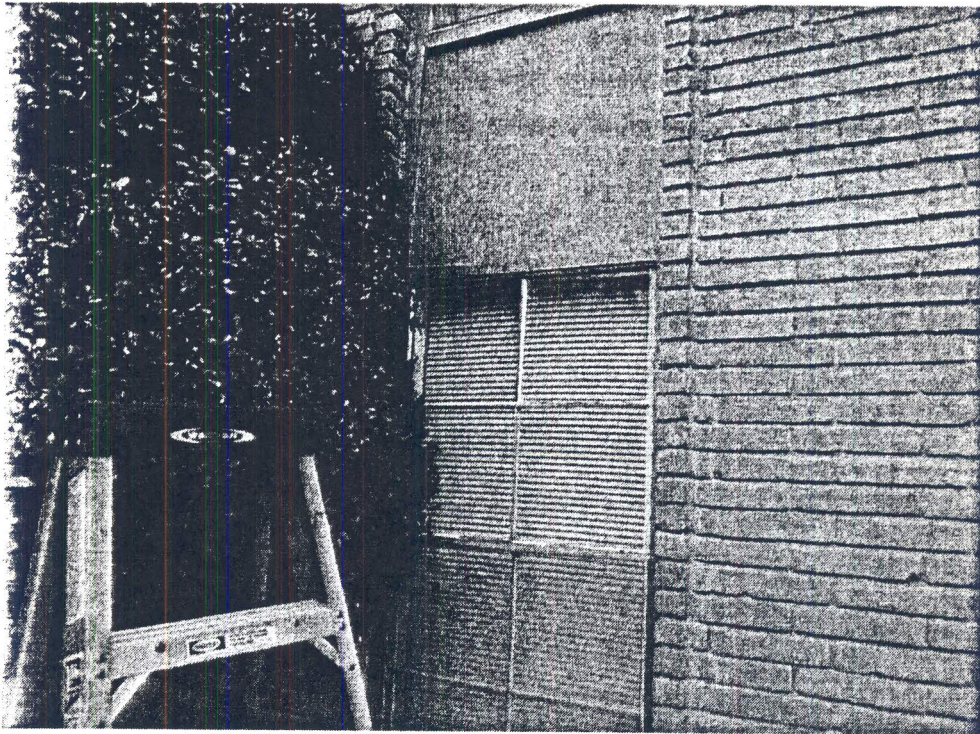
VIEW OF THE WOOD WINDOW CASINGS OF BUILDING #1 WHICH ARE COATED WITH LBP.
